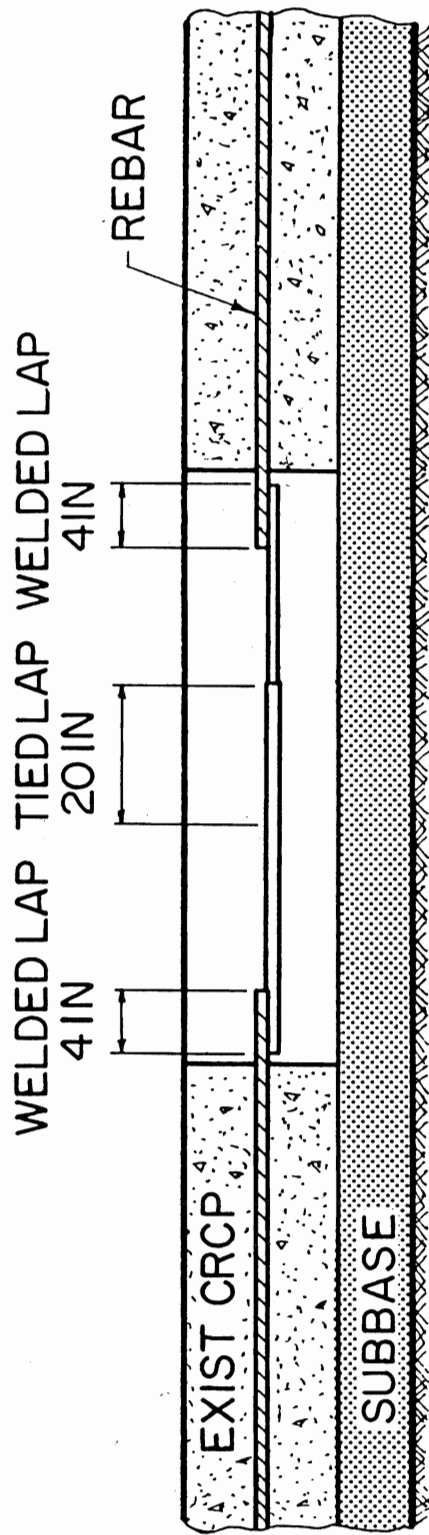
Details of Welded or Mechanical Connection Reinforcement Repair (Ref. 10).
